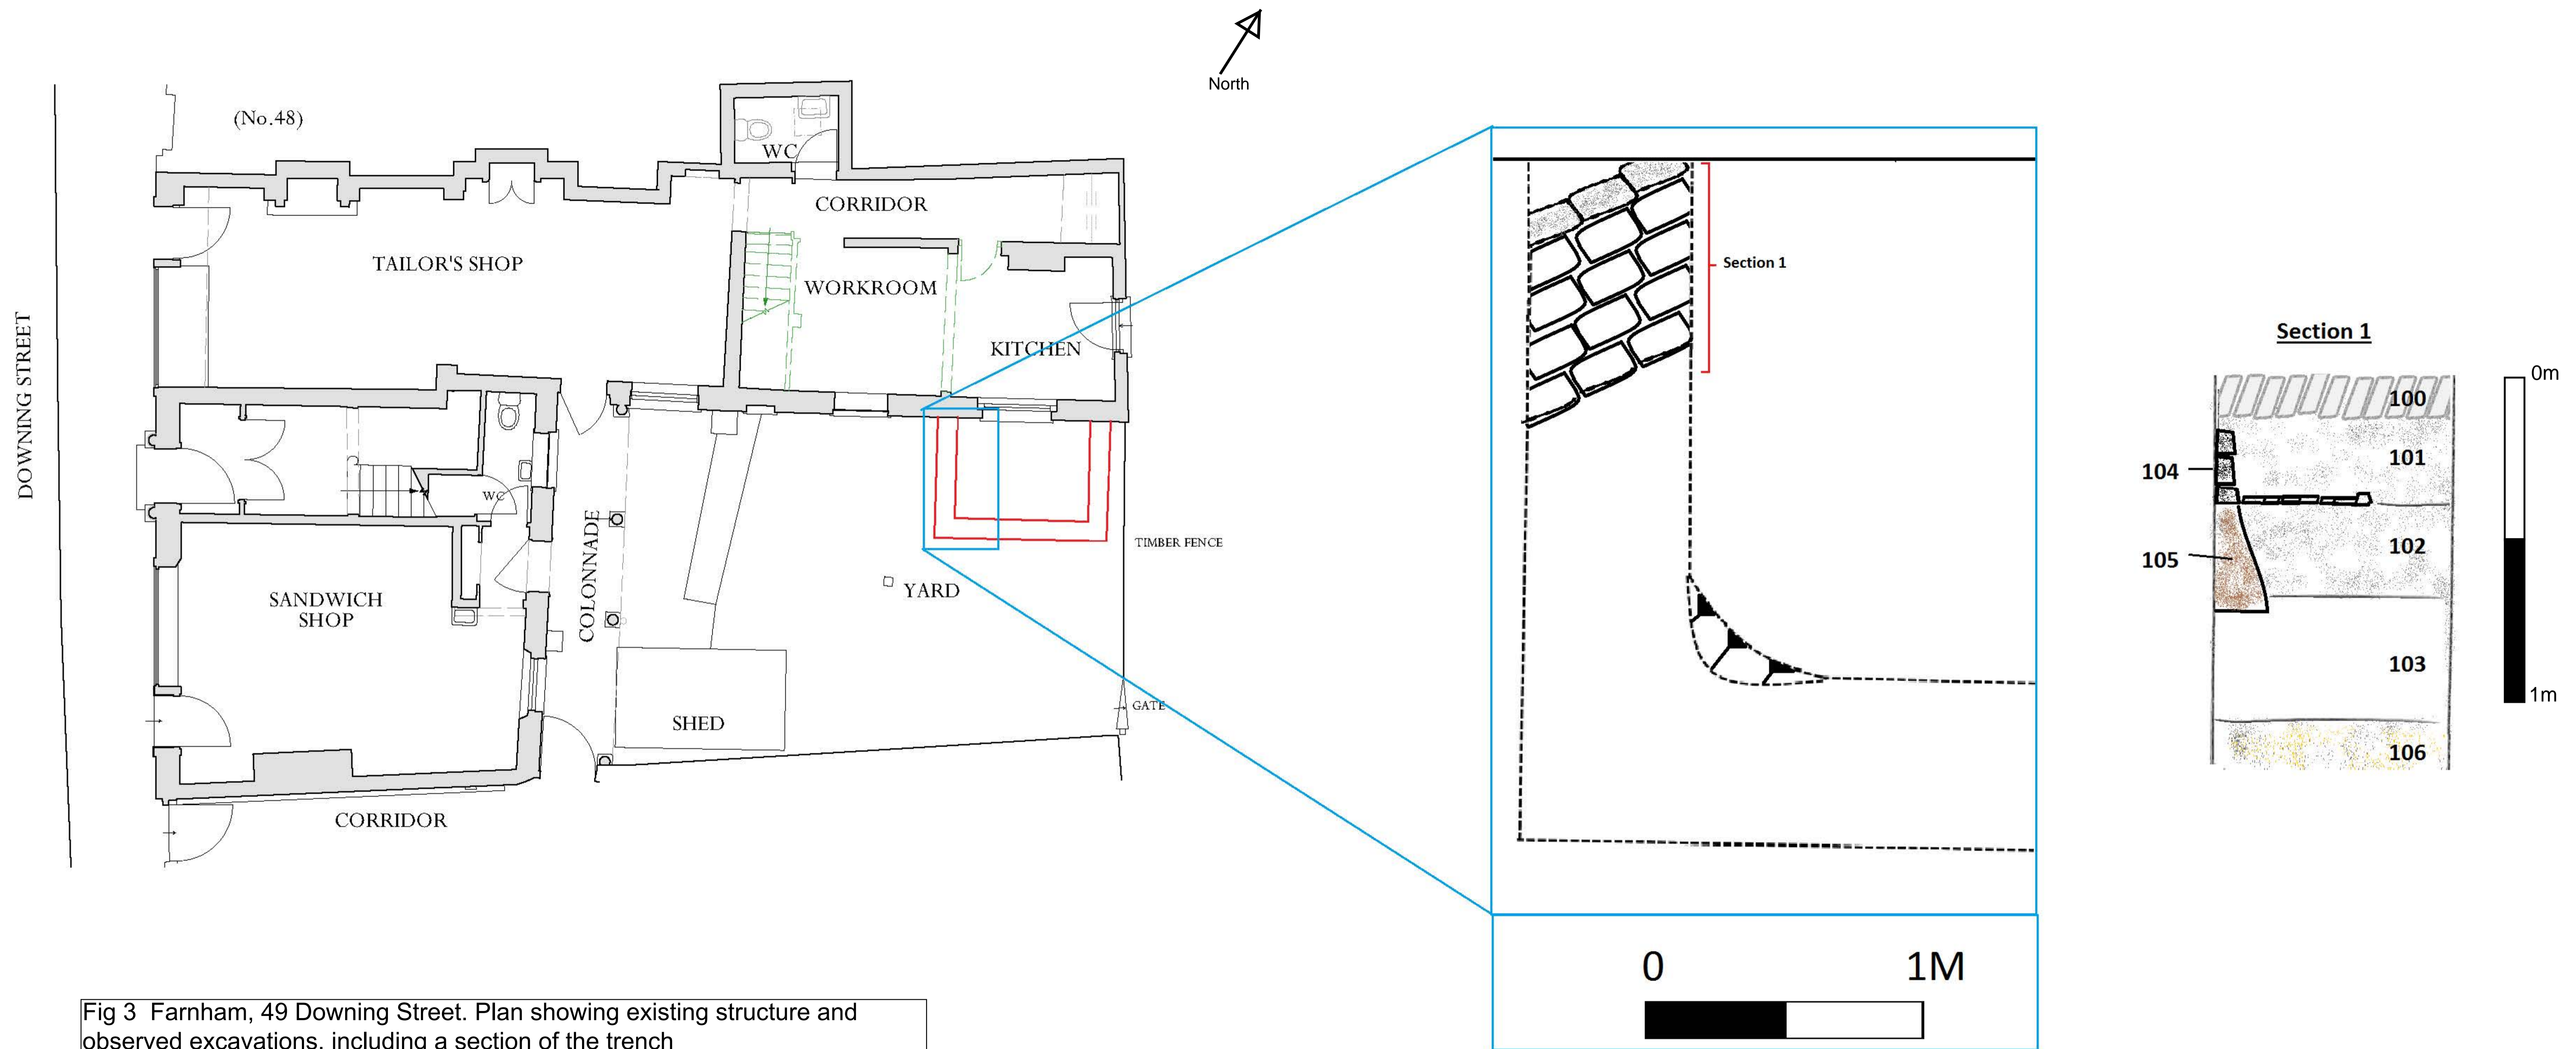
Farnham, 49 Downing Street. Plan showing existing structure and observed excavations, including a section of the trench
